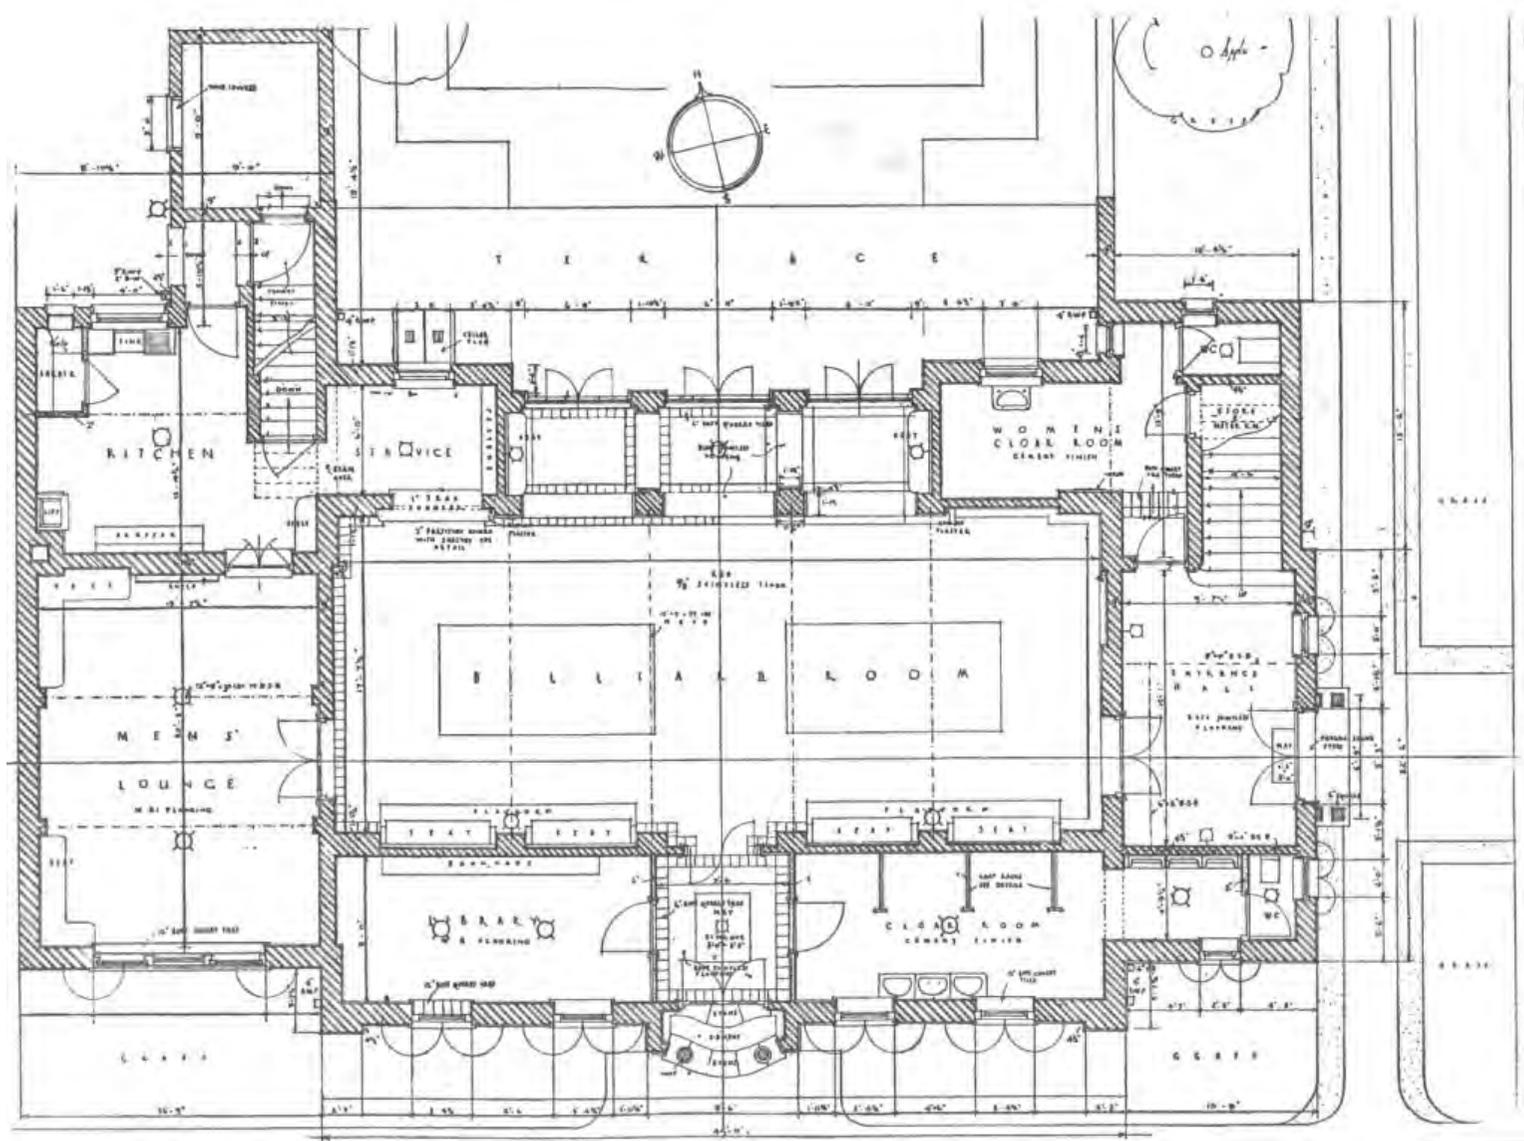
Original plans of the club house Ground Floor (Architects' Journal)
